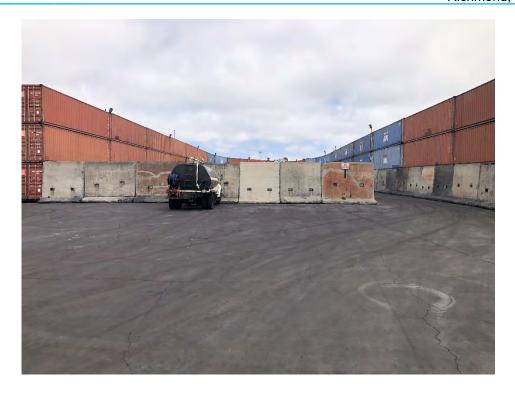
Looking north at the area south of the secondary bulk product storage area. No significant cracking or deterioration is visible.
